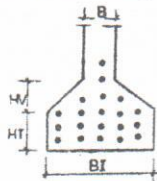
Disposition of bars in the splayed bars in the basis of a reinforced concrete beam.
